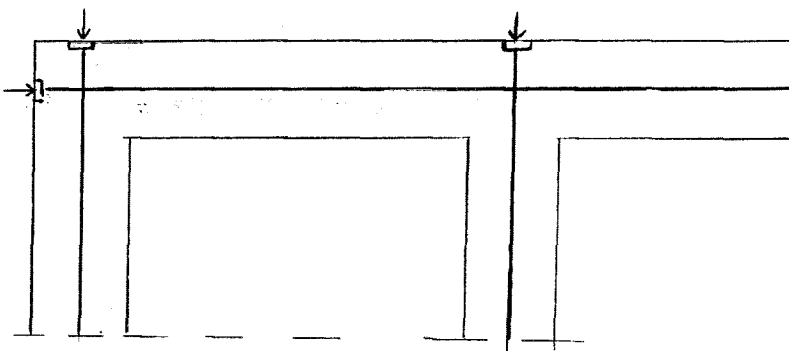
Symmetrical placement of the prestressing steel reinforcement.
